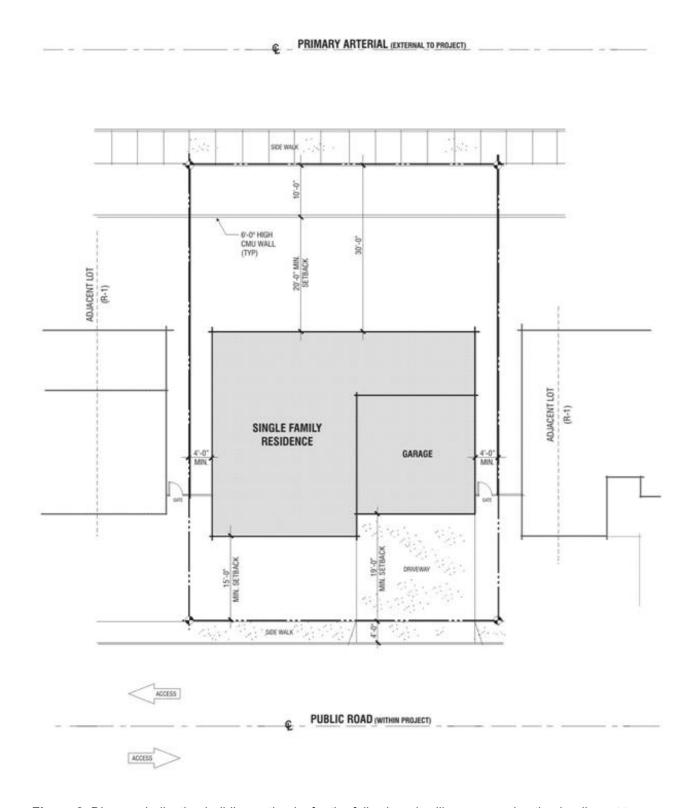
Diagram indicating building setbacks for the following: dwelling rear yard setback adjacent to an existing R-1single-family residence; dwelling side yard setbacks adjacent a primary arterial and an R-1 lot
